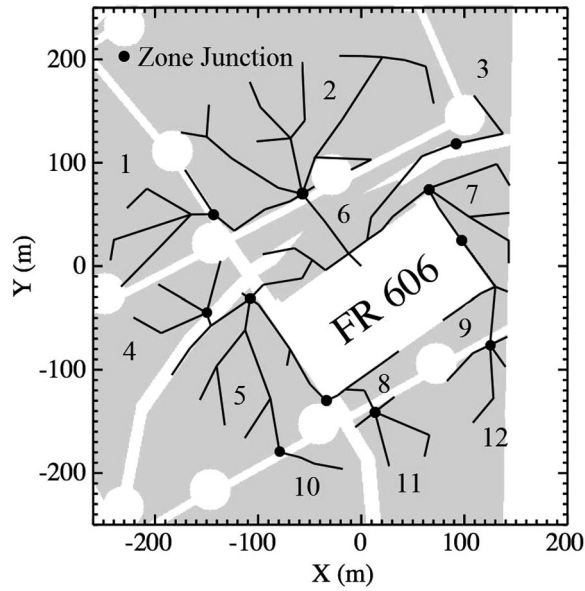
Proposed cable and trench layout, showing junctions between the zones (Girard, 2013).
